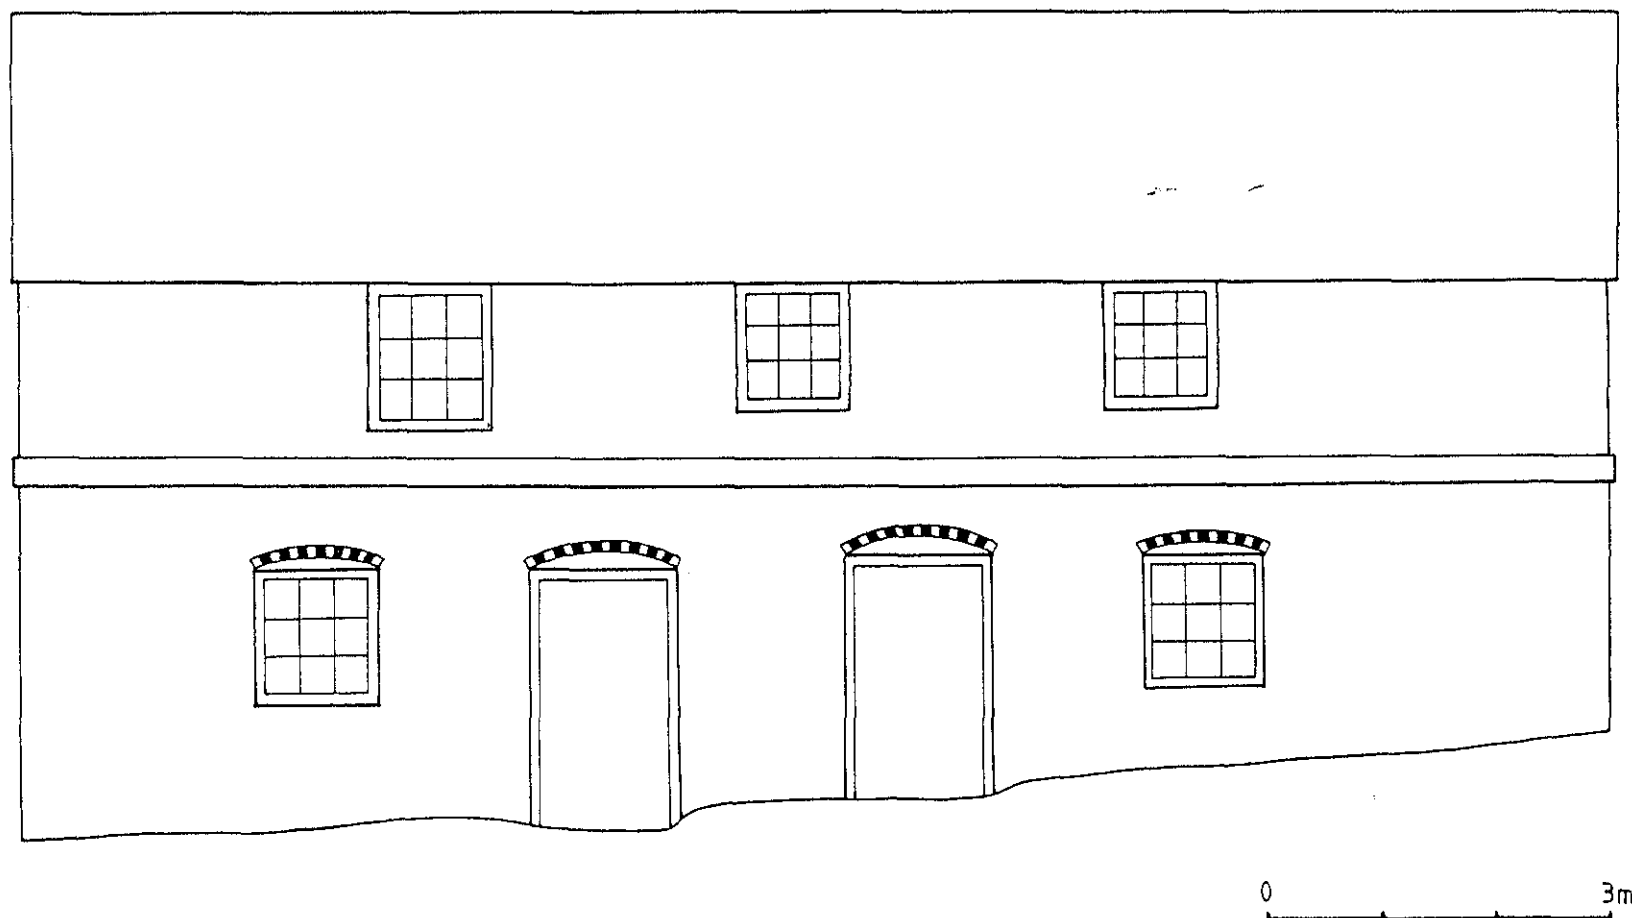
Suggested reconstruction of the front elevation of the Large Barn (structure 2) in its eighteenth century form.
